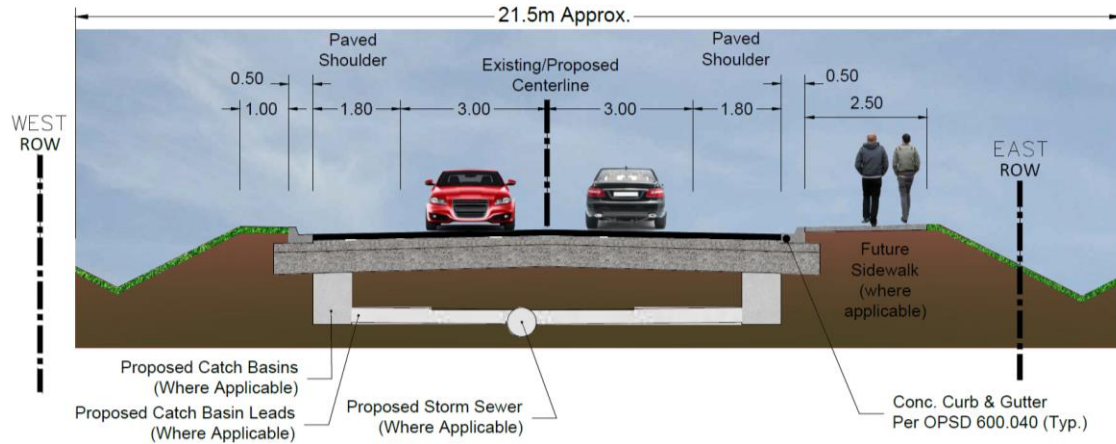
Typical Urban Cross Section with V-Ditch and Storm Sewer
